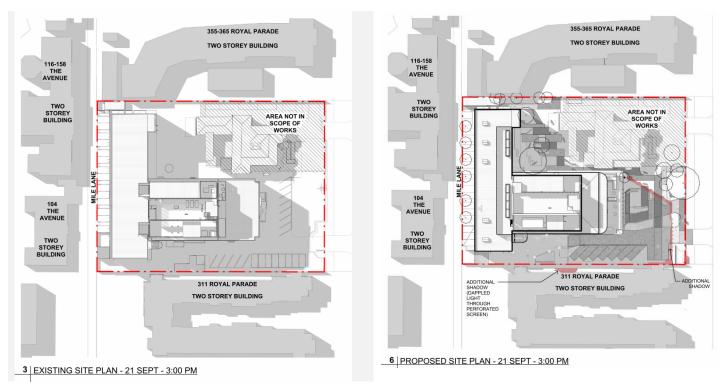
Existing and proposed overshadowing extent - 3pm 21st September (additional shadow extent in red)
